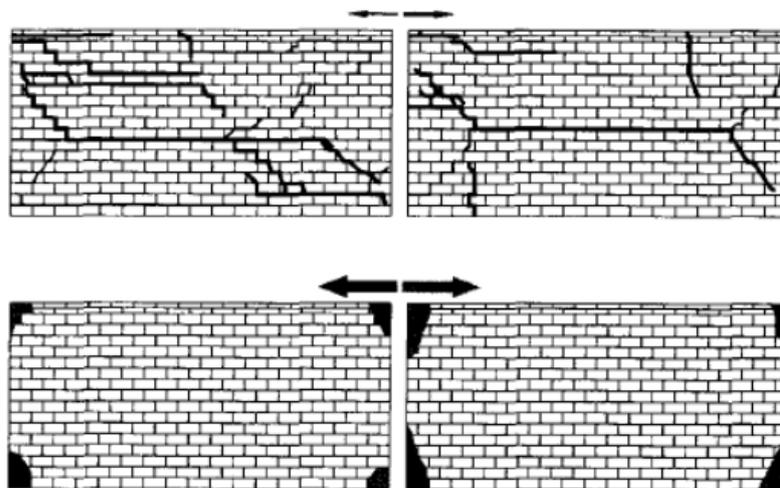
Modes of failure of infill walls (Mosalam et. Al.,1997)
